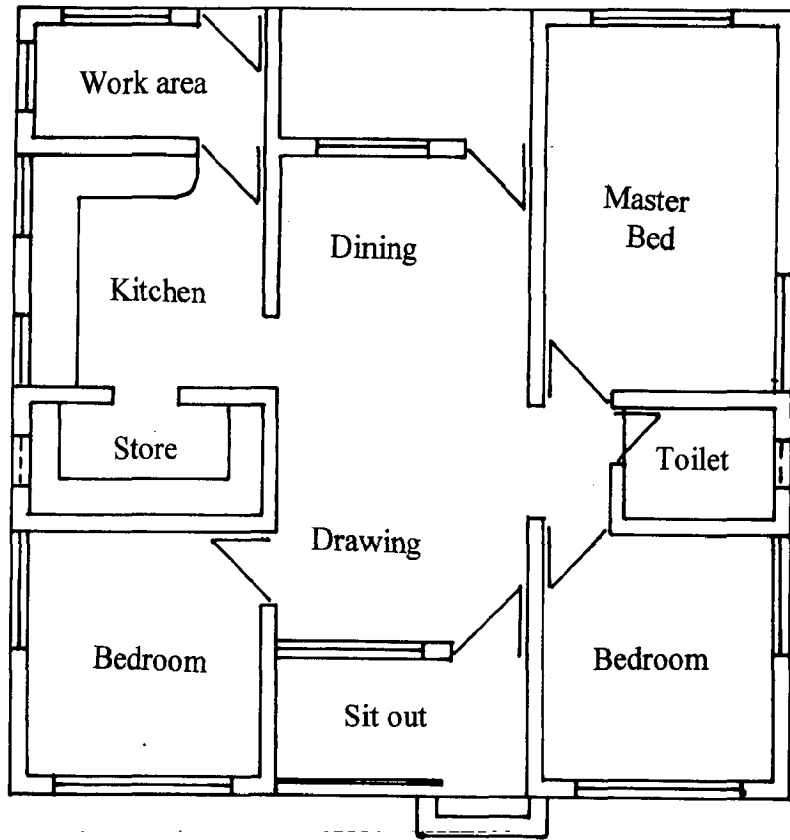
Plan: Martin's Residence, Scale 1:100
